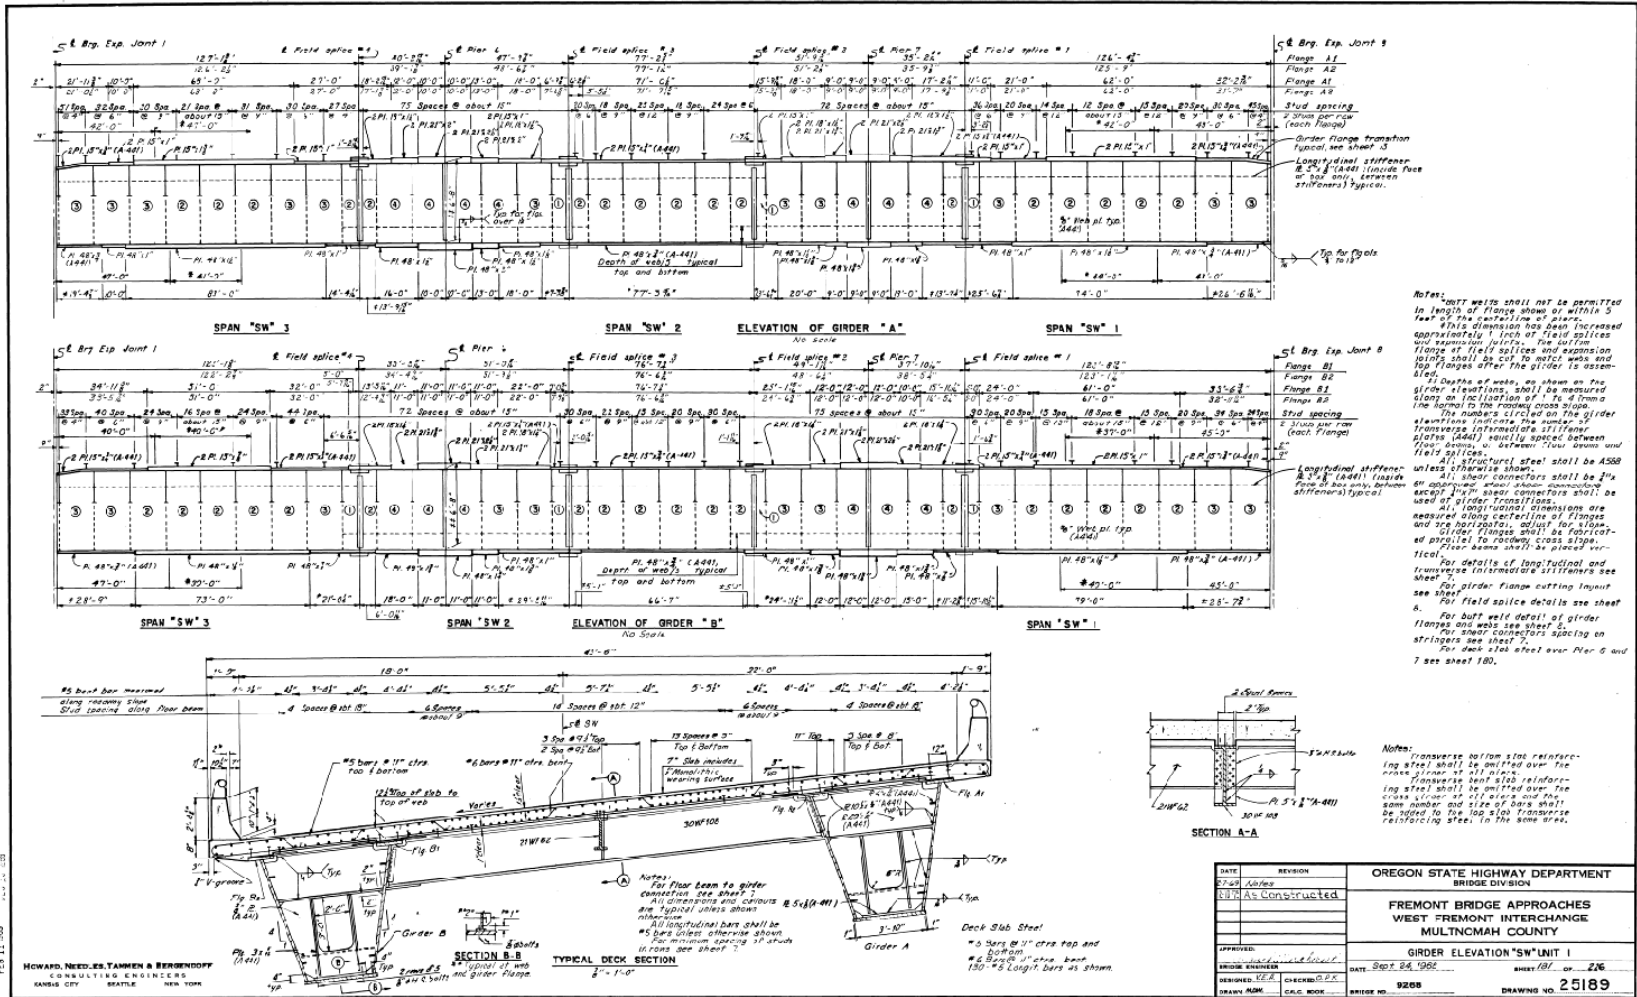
Structural details of SW Unit 1 Bridge superstructure 09268A.
